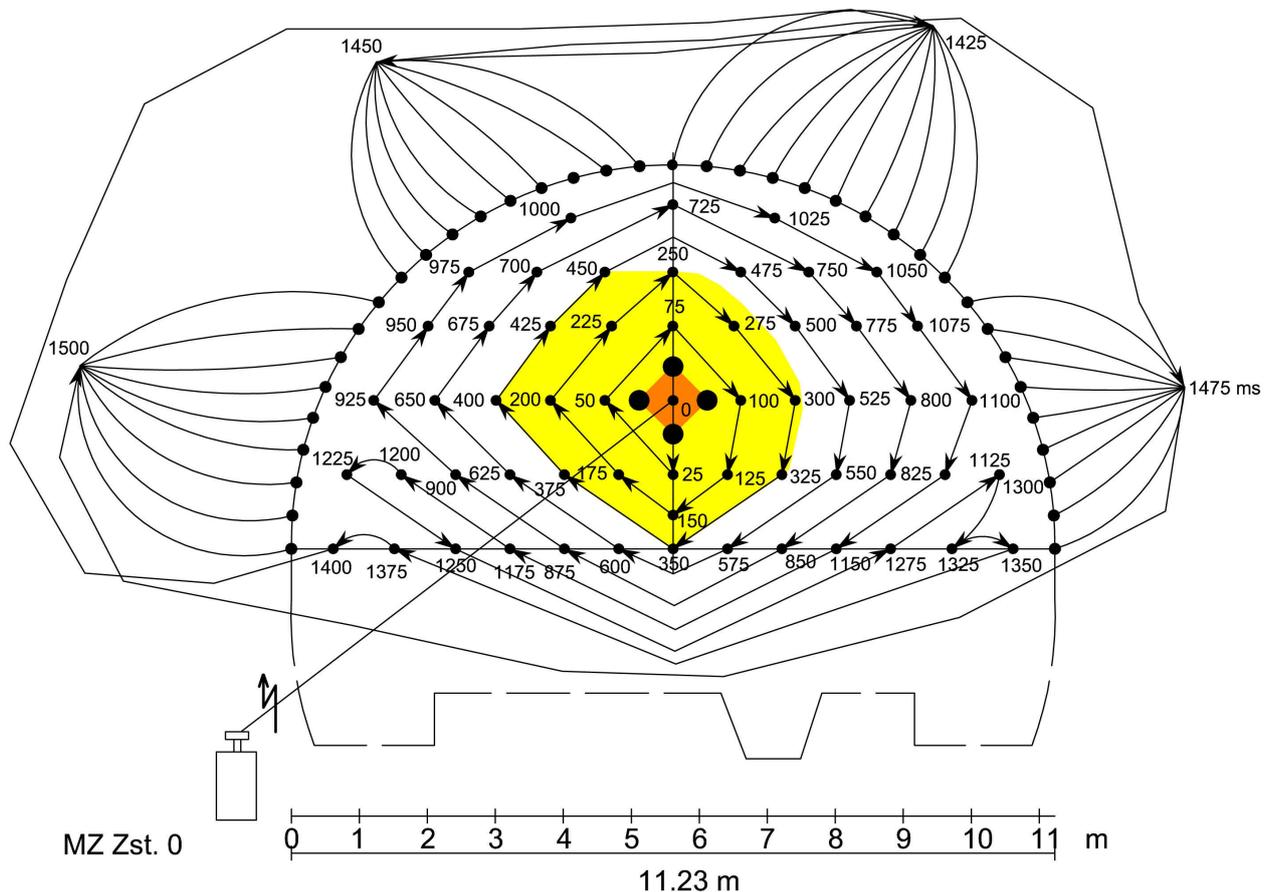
Blast hole and firing pattern for the roof section of a tunnel with single-hole detonation in the area of the production and auxiliary holes (non-electric surface delay)
